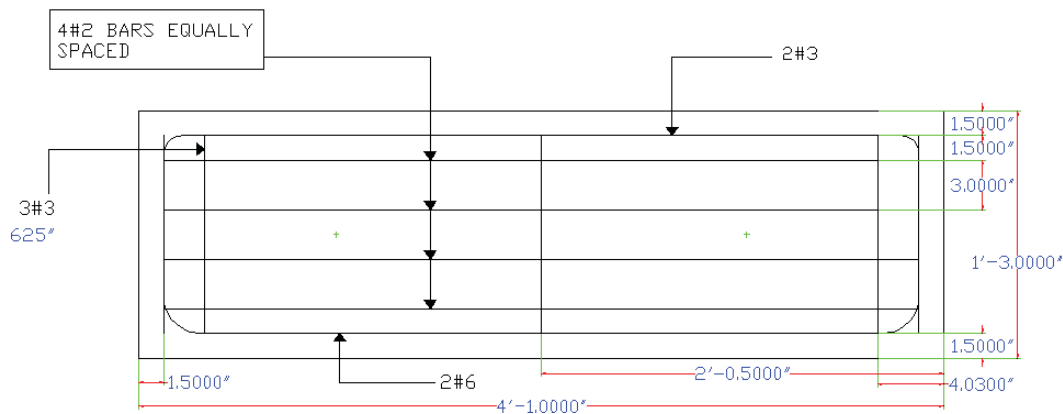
Reinforcement details of 381mm (15in) deep beam
